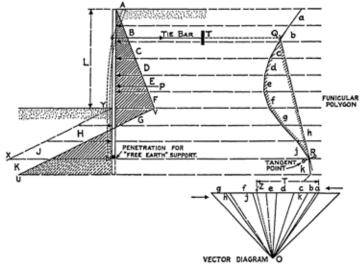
Sheet Piling "Free Earth" Condition.
